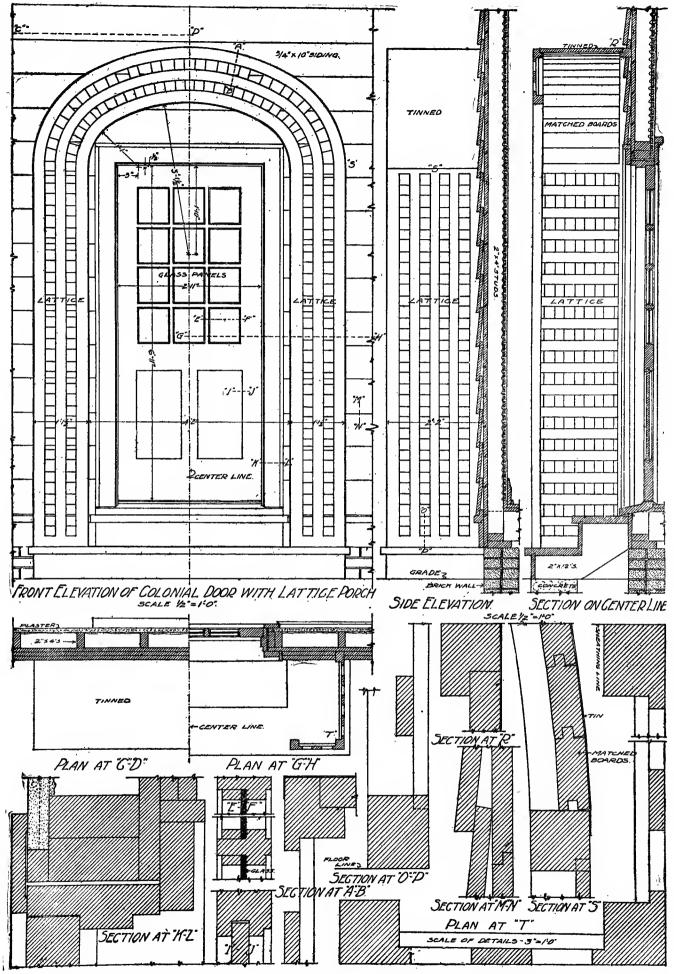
DETAILS OF COLONIAL DOOR WITH LATTICE HOOD
